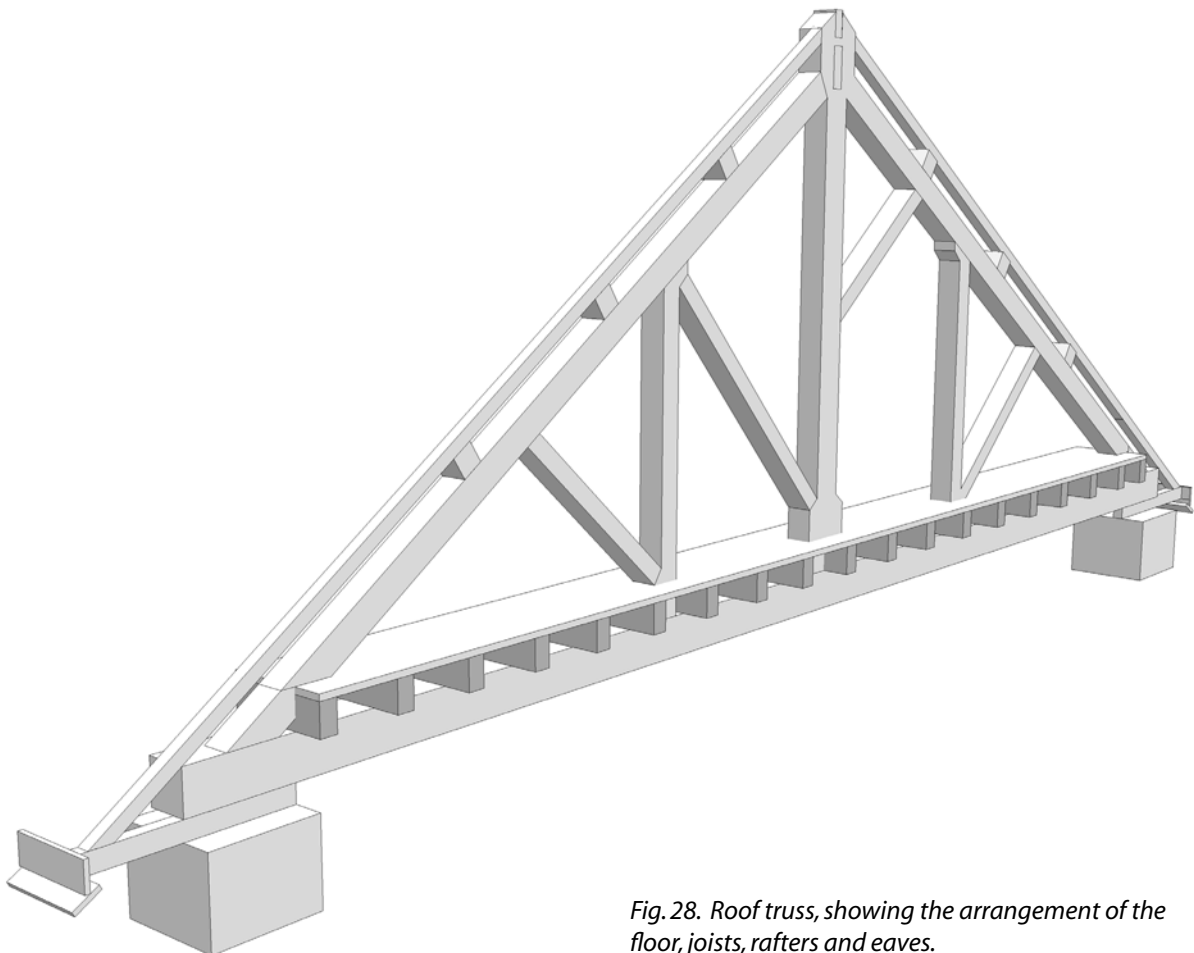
Roof truss, showing the arrangement of the floor, joists, rafters and eaves.
